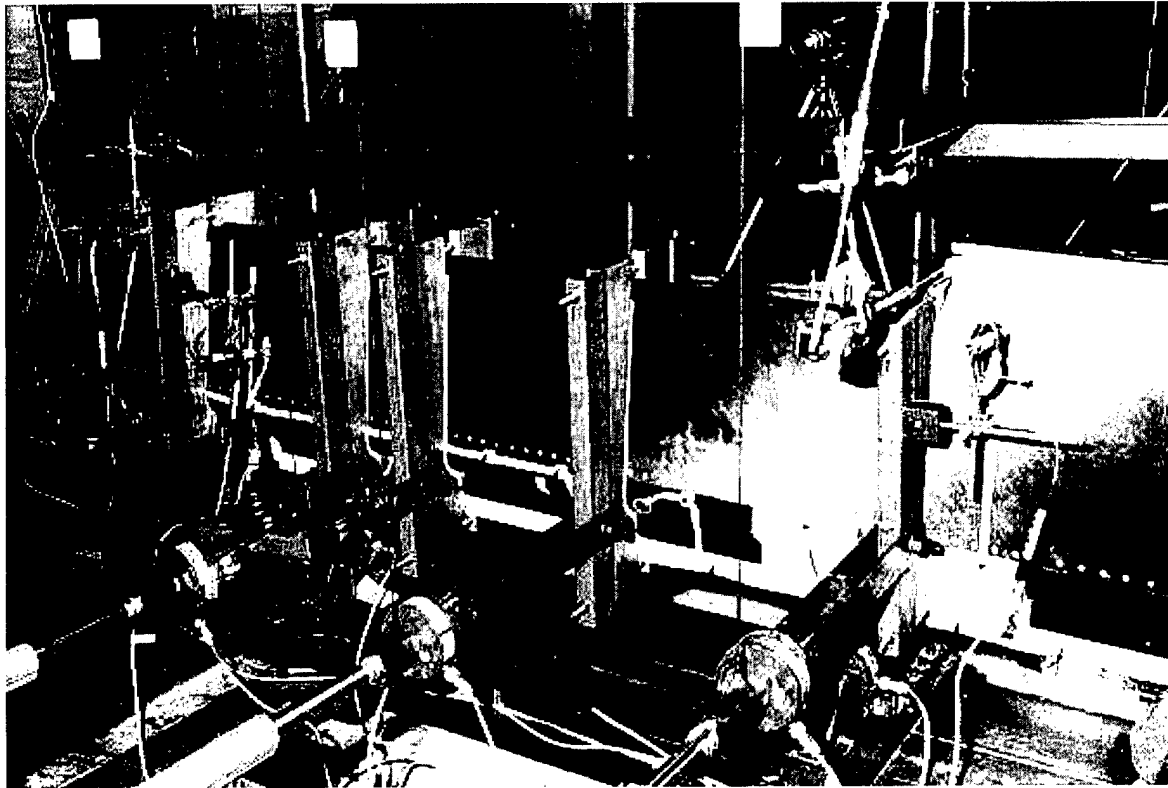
Detailed view of the test arrangement (looking at top skin).
